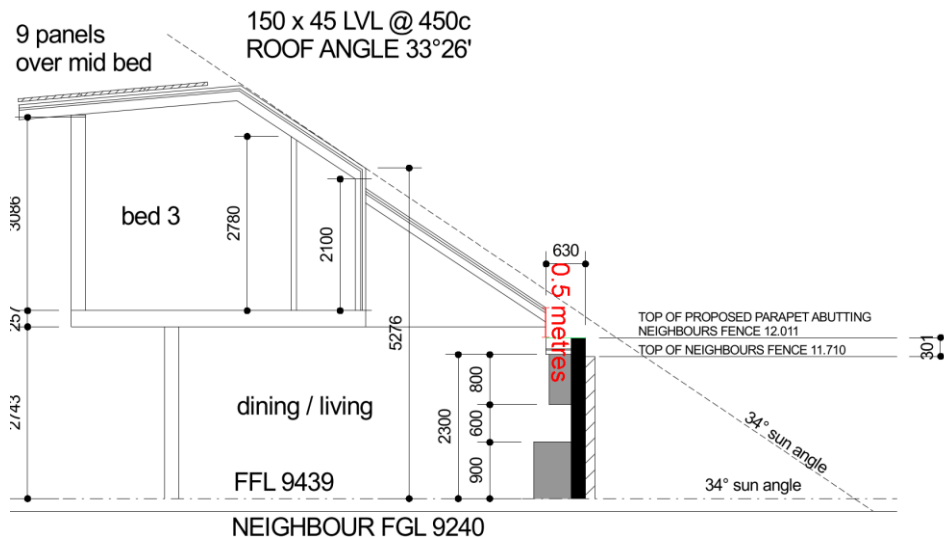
Cross section of boundary wall as it faces towards the neighbours outdoor spaces.
